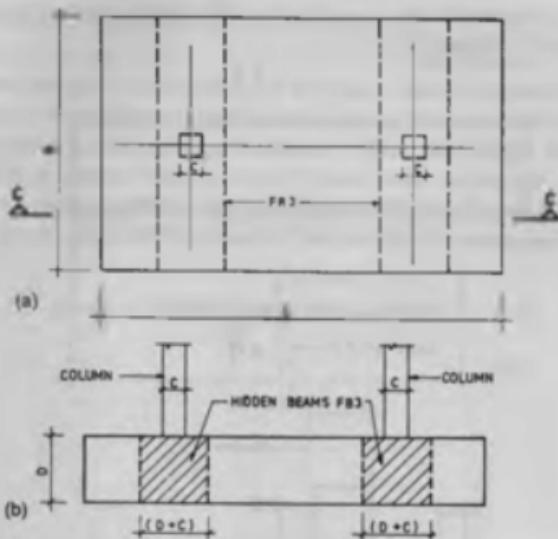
C. Combined footings three alternatives. (a) Plan of combined footing of uniform depth; (b) Section C-C.
